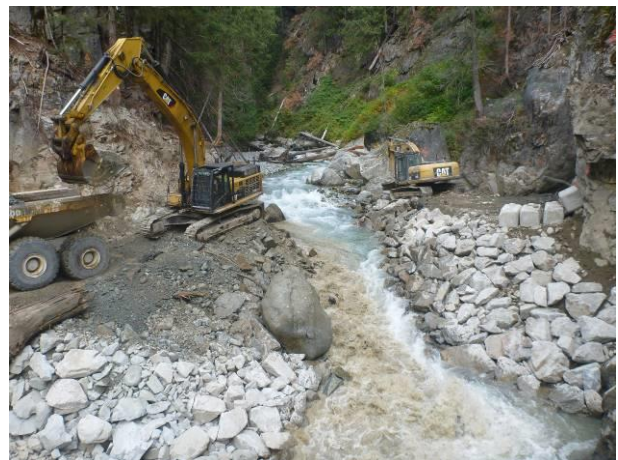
Removal of the downstream coffer dam, all excavation occurred in the dry (September 29, 2016).
